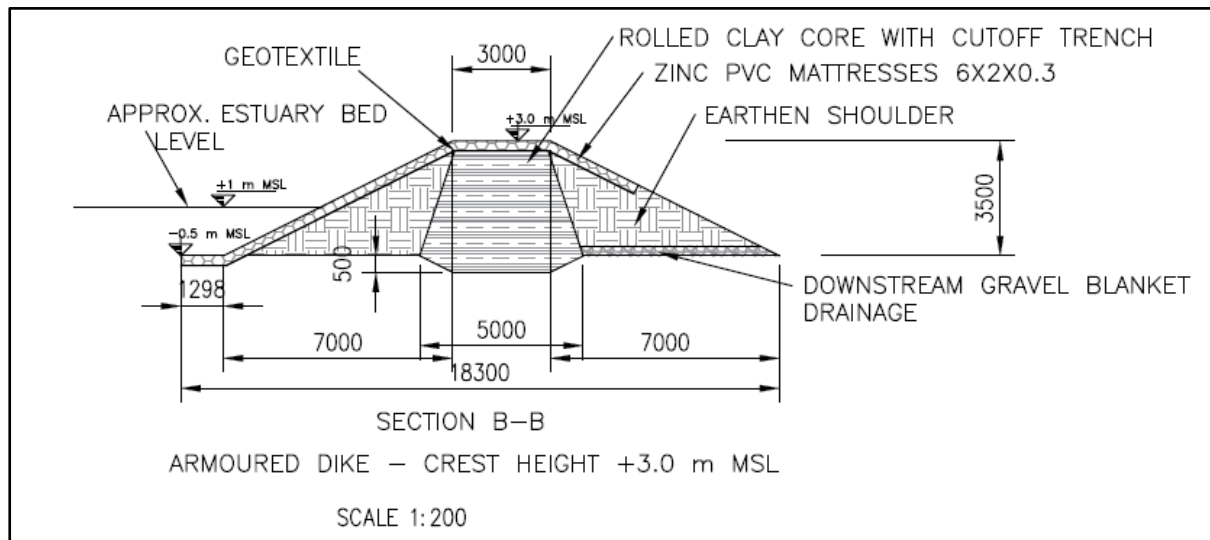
Conceptual cross-section layout of the Armoured dike structure with the crest height of +3 m MSL
